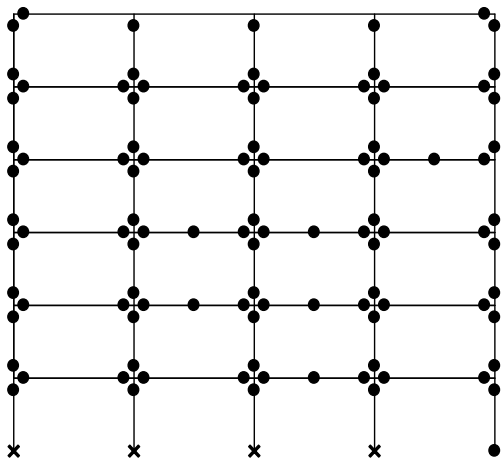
Damage to Frame 4 (SMA at the ends of the fourth floor beams)
